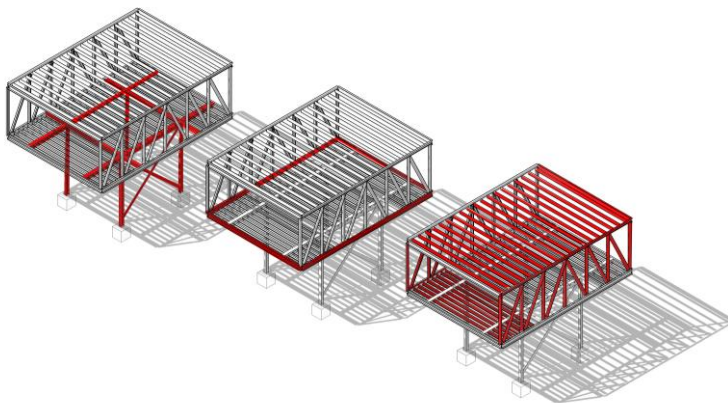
Steel (frame) structure school building Abdij van Bernestraat
